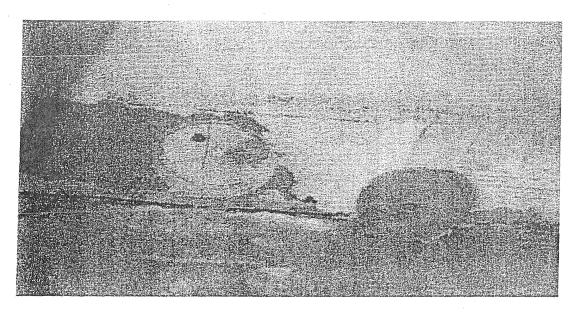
11TS5, West Wall, Drilled Core South of Door.
